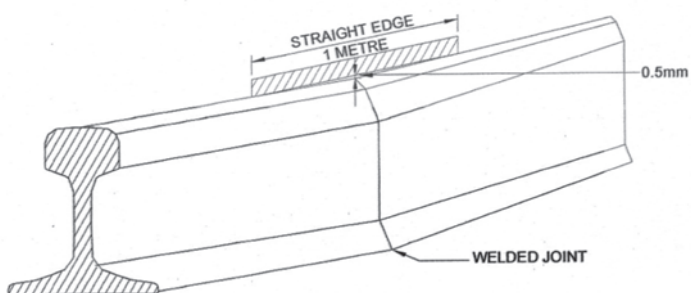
(f) Tolerance for Vertical Misalignment of Low Welded Joint with Old Rails
